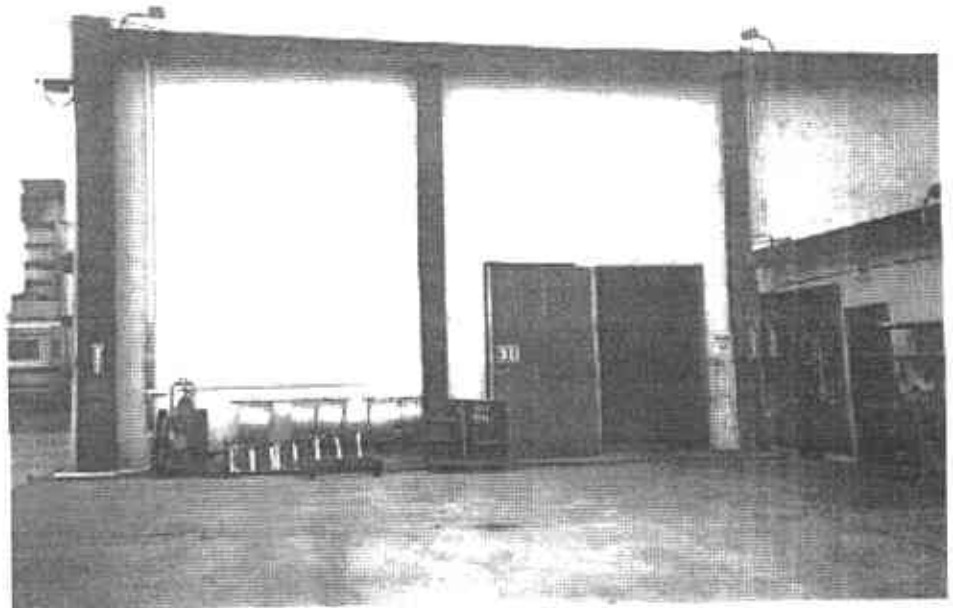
National Airmotive Engine Test Facility, building and asphalt/concrete parking area.
